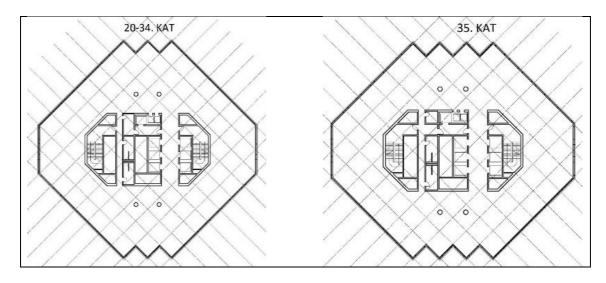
Twentieth to thirty-fifth floor plans of İş Tower
